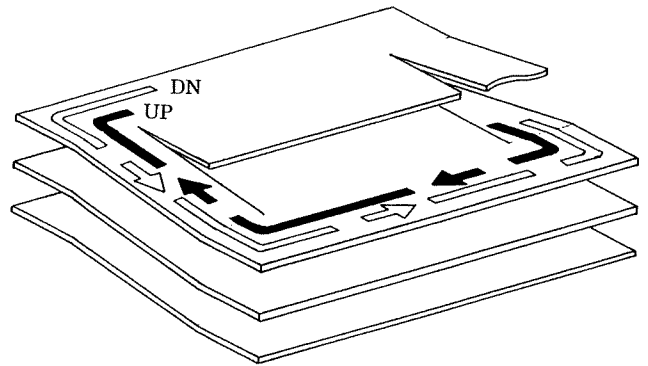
Two-way staggered floor ramp system. Ramps are placed at the ends of the garage to minimize turning conflicts.
